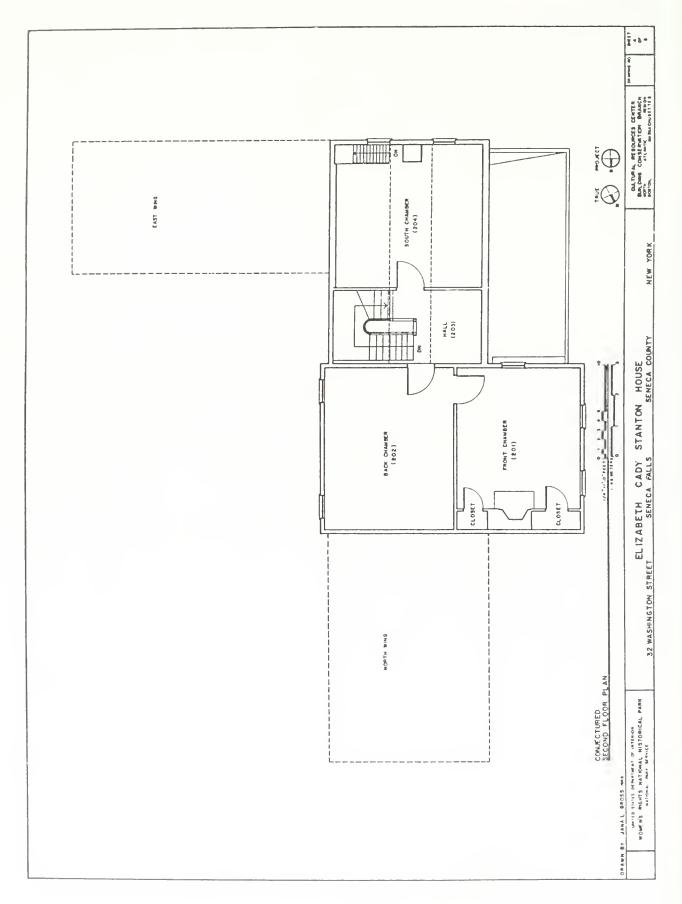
Stanton House: conjectural second-floor plan, circa 1847-62.
